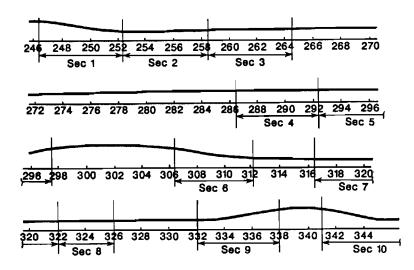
Profile of the 10 test sections, east bound IH 610 North, Houston.
